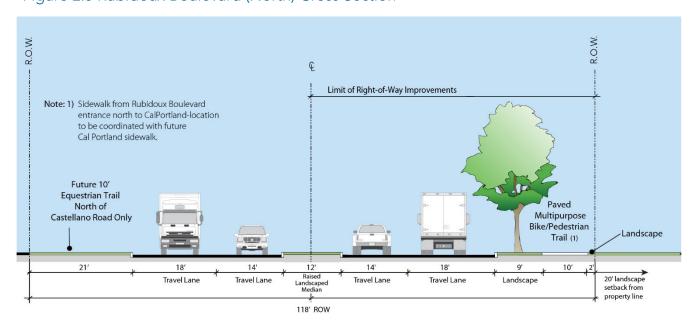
Rubidoux Boulevard (North) Cross Section
